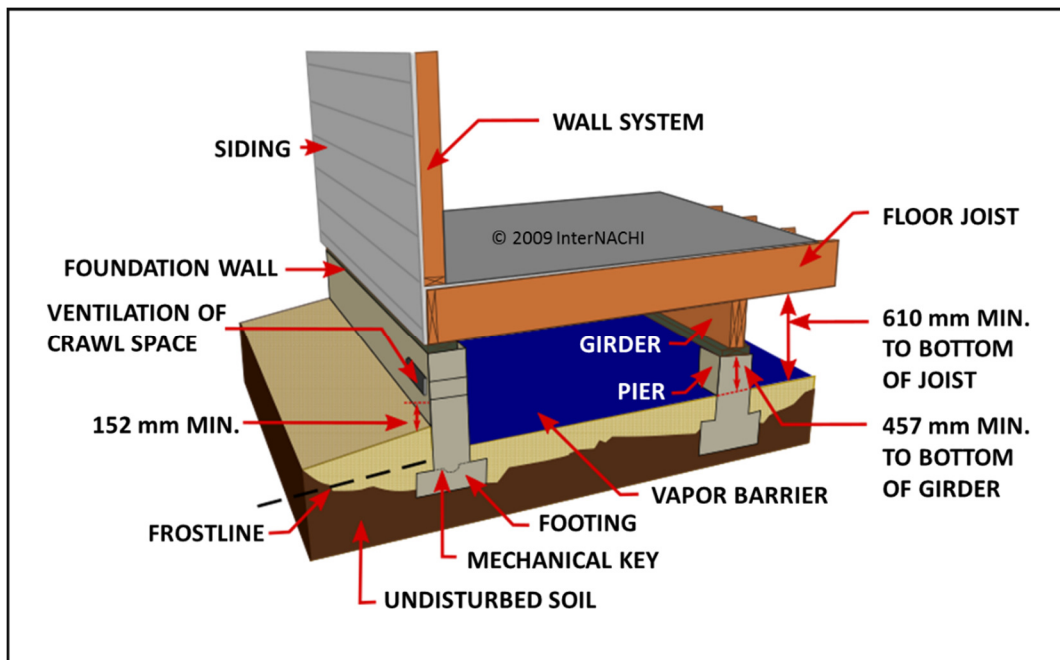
Crawlspace Foundation (source: InterNachi Corporation)
